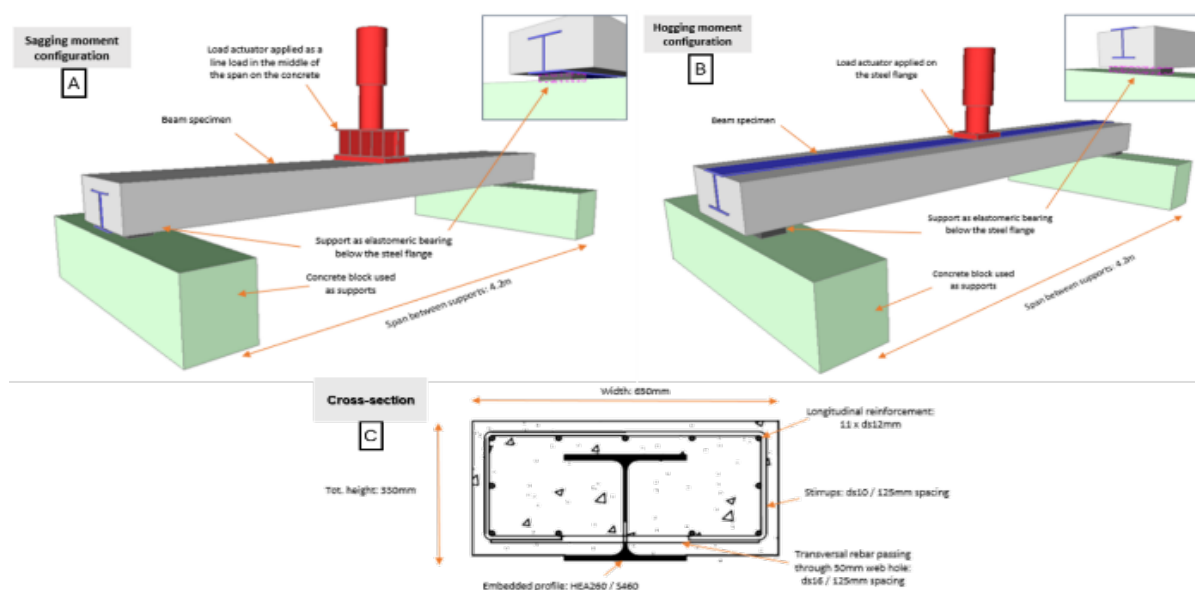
Cross-section of the test specimens. Test setup for sagging (A) and hogging (B) bending moment
